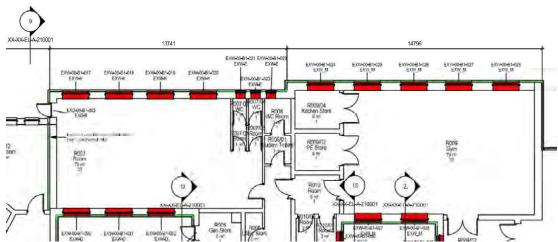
Proposed Plan showing proposed external wall insulation to front of school (in green).
